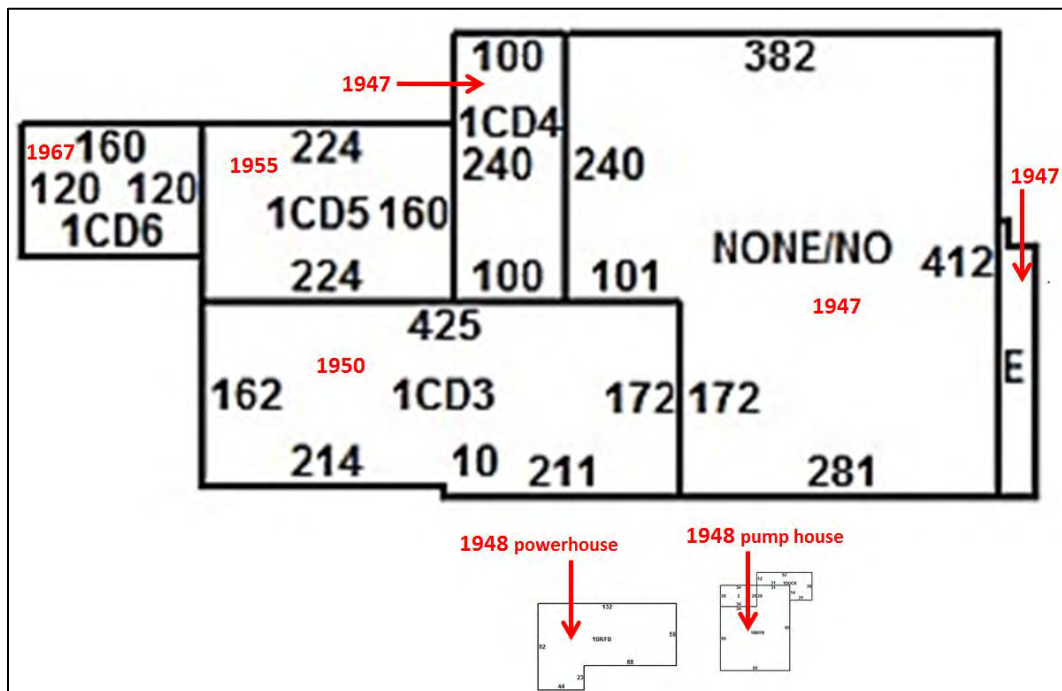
Tax record floorplans and dates (powerhouse and pump house not to scale)
